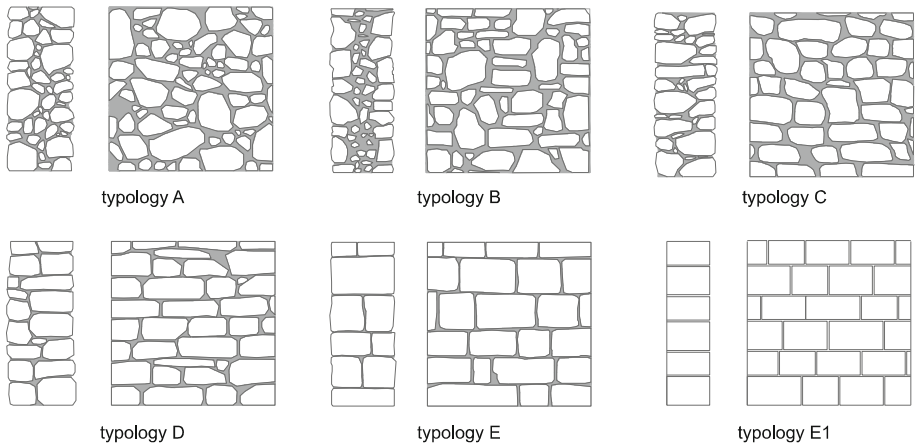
Stone masonry typologies: sketches of typical textures and cross-sections
